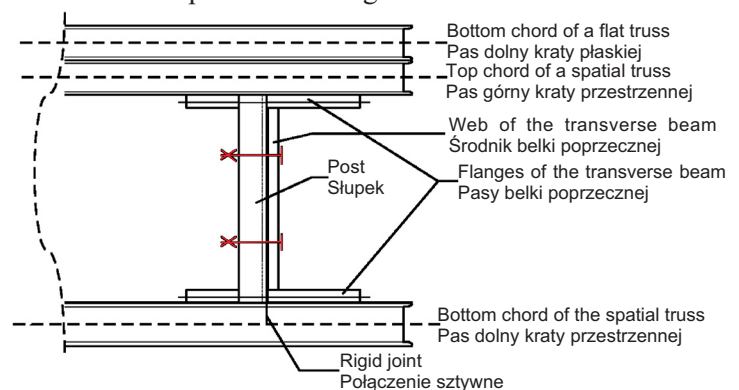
The scheme of the joint between the transverse beam and the spatial truss of the DMS-65 bridge
